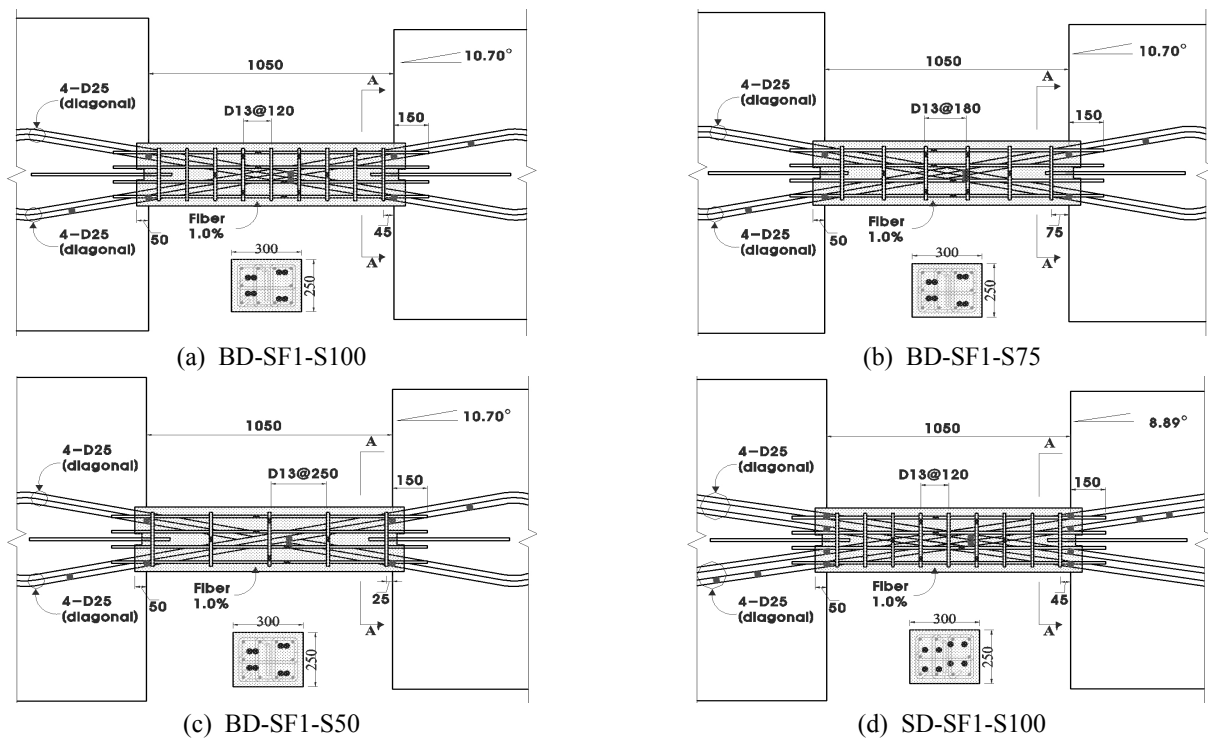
Reinforcement details and strain gauge layout for four specimens
